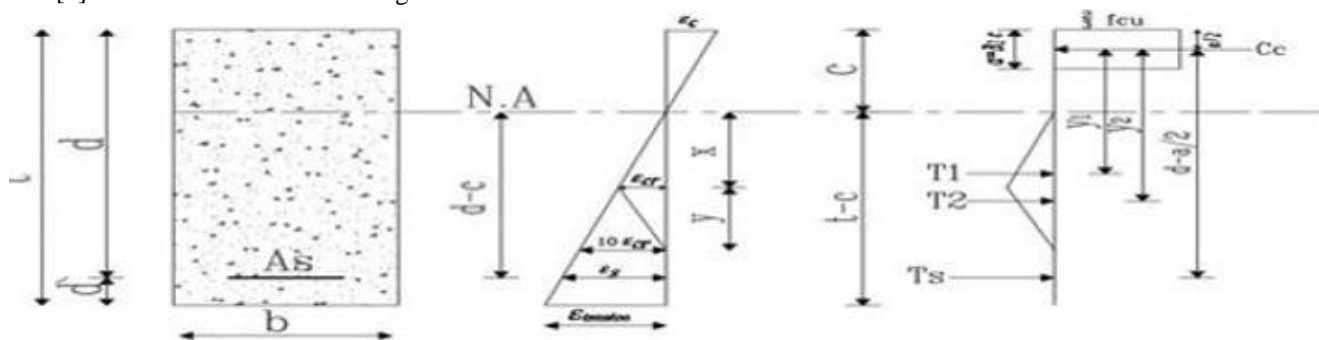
The stress and strain distribution along arectangular reinforced concrete section.
